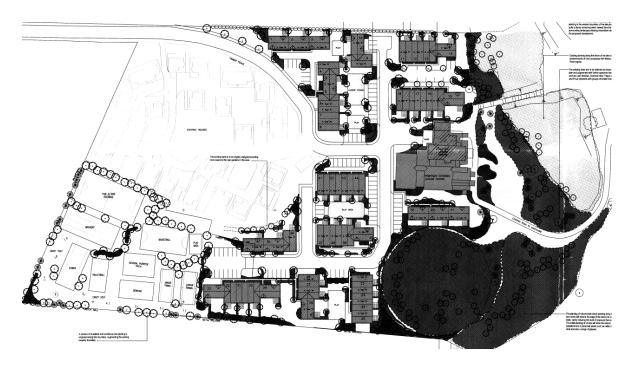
Reg. Ref. 026968 Proposed Site Layout
